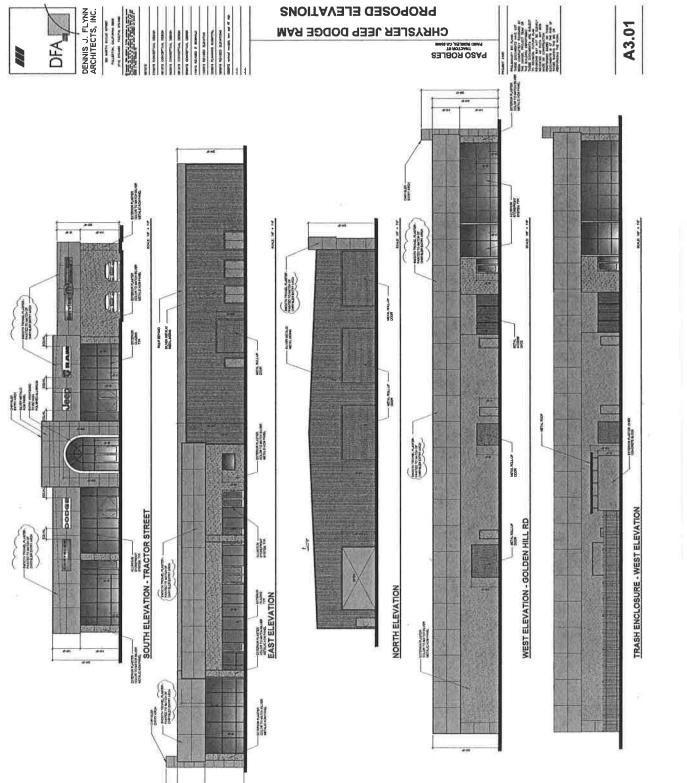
Exhibit F Architectural Elevations PD 13-006 & CUP 13-008 (Mullahey Chrysler)
